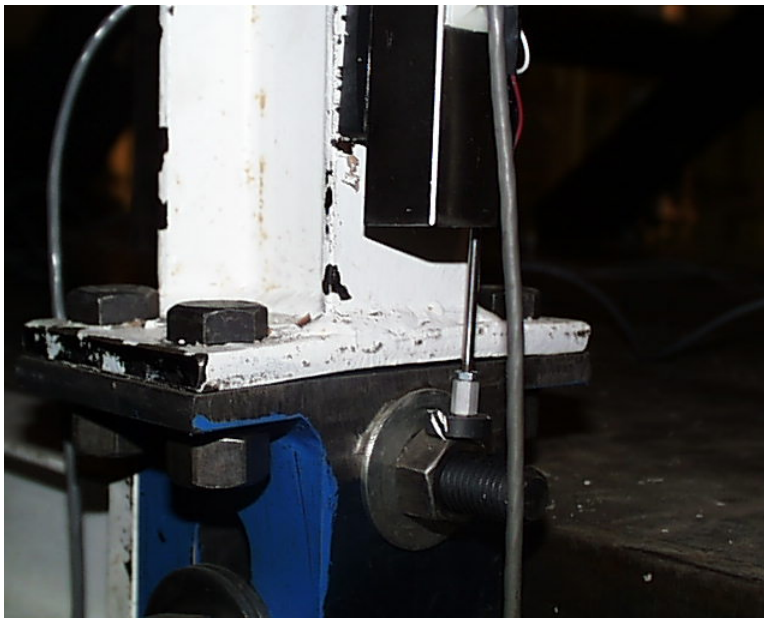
Structural Damage on Beam Column Connection – Prying Effect
